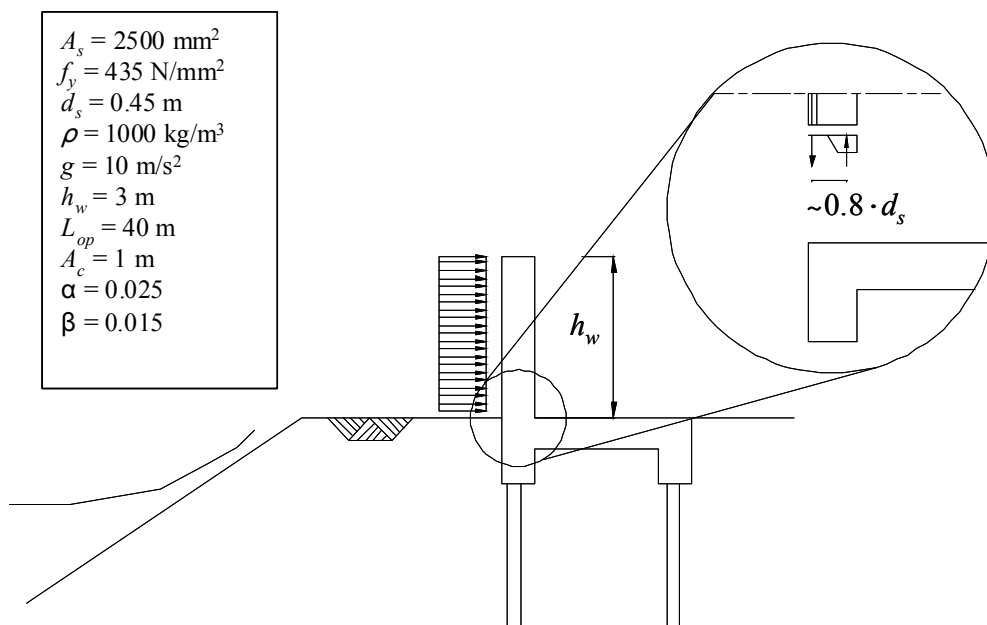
Wave impact on a crown wall (from Rock Manual)
